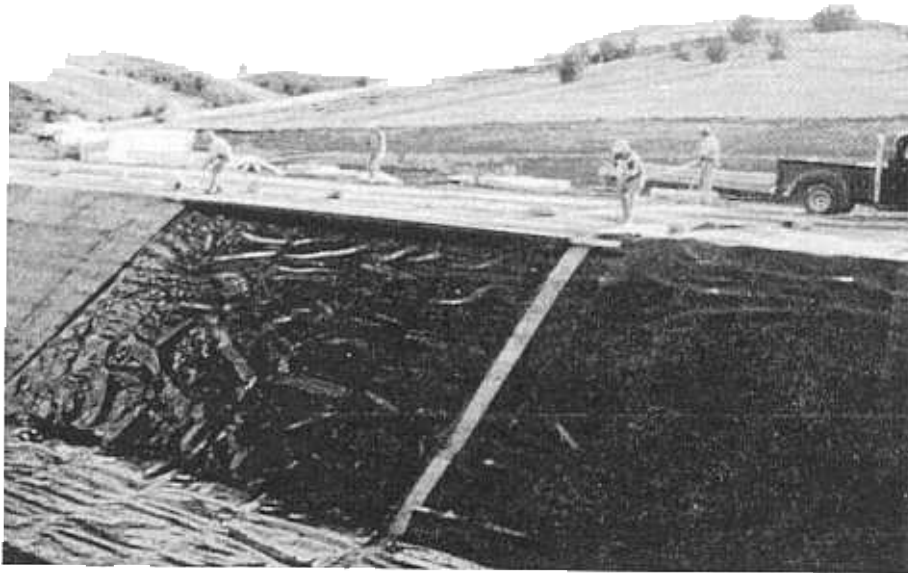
Positioning HDPE geomembrane prior to heat welding the adjacent sheets.
